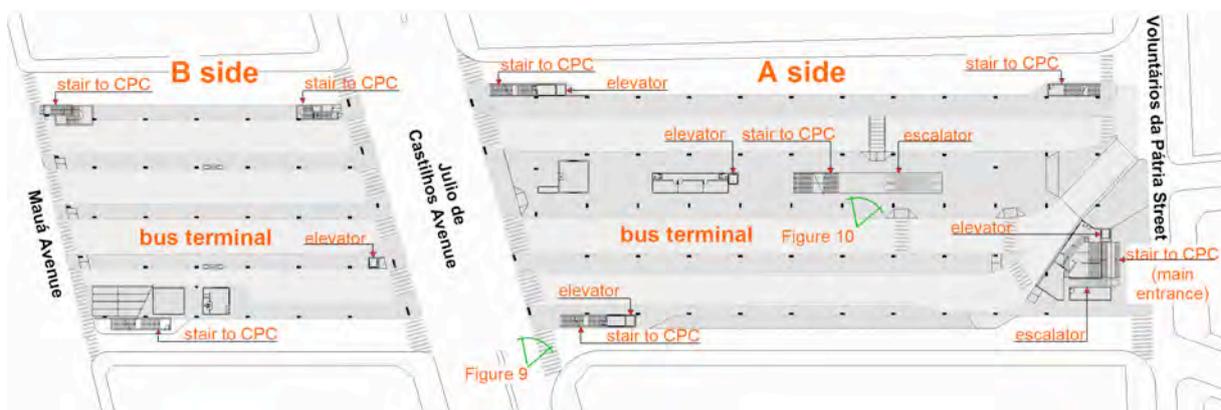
CPC ground floor plan. (Source: Adapted from Prefeitura Municipal de Porto Alegre, 2009).
